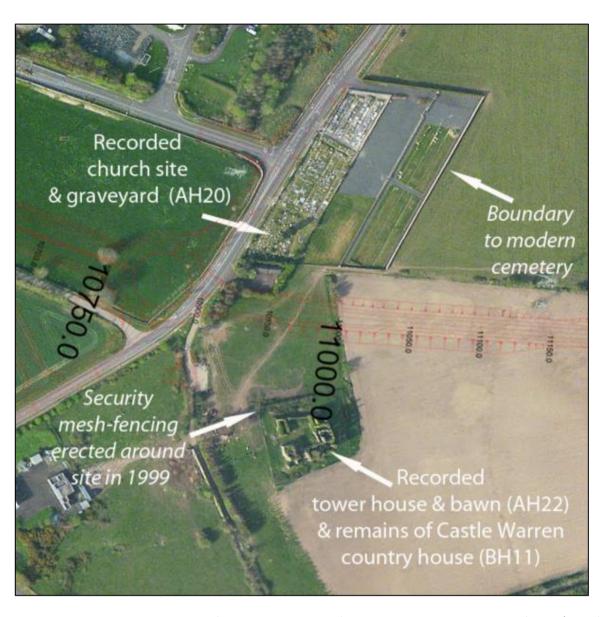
Aerial photograph (OSI Digital Globe 2013) showing showing Castle Warren (AH22 / BH11) & Barnahely church site & graveyard (AH20), with proposed M28 road project overlaid
